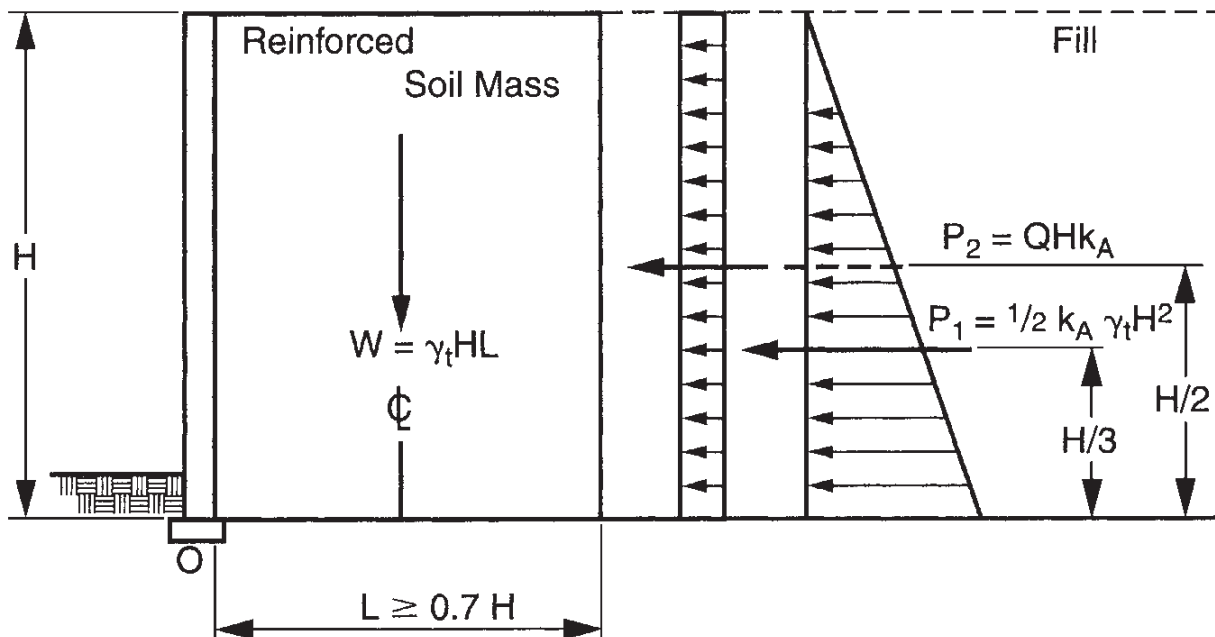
Static design analysis for mechanically stabilized earth retaining wall having horizontal backfill. (Adapted from *Standard Specifications for Highway Bridges*, AASHTO 1996.)
